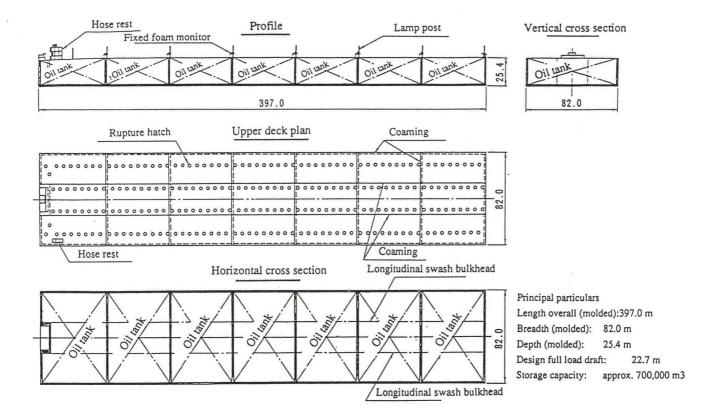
GENERAL ARRANGEMENT OF STOCKPILING VESSEL
